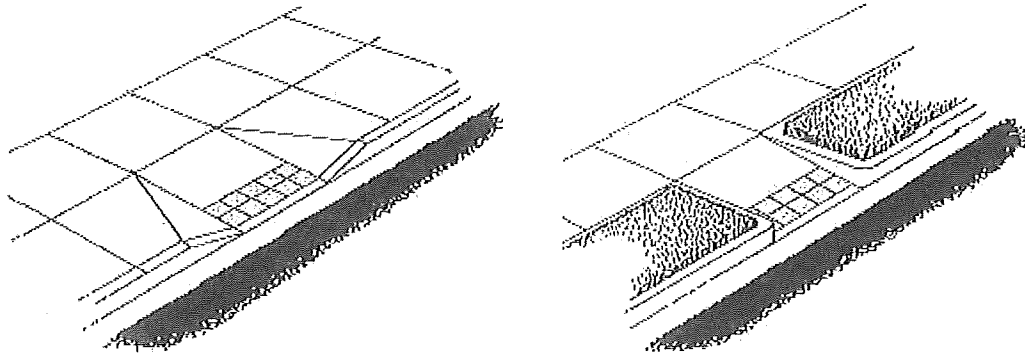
Flares provide a gradual transition between the sidewalk and the ramp. Returned curbs transition much more abruptly and should only be used in areas that pedestrians would not normally travel such as planting strips.
